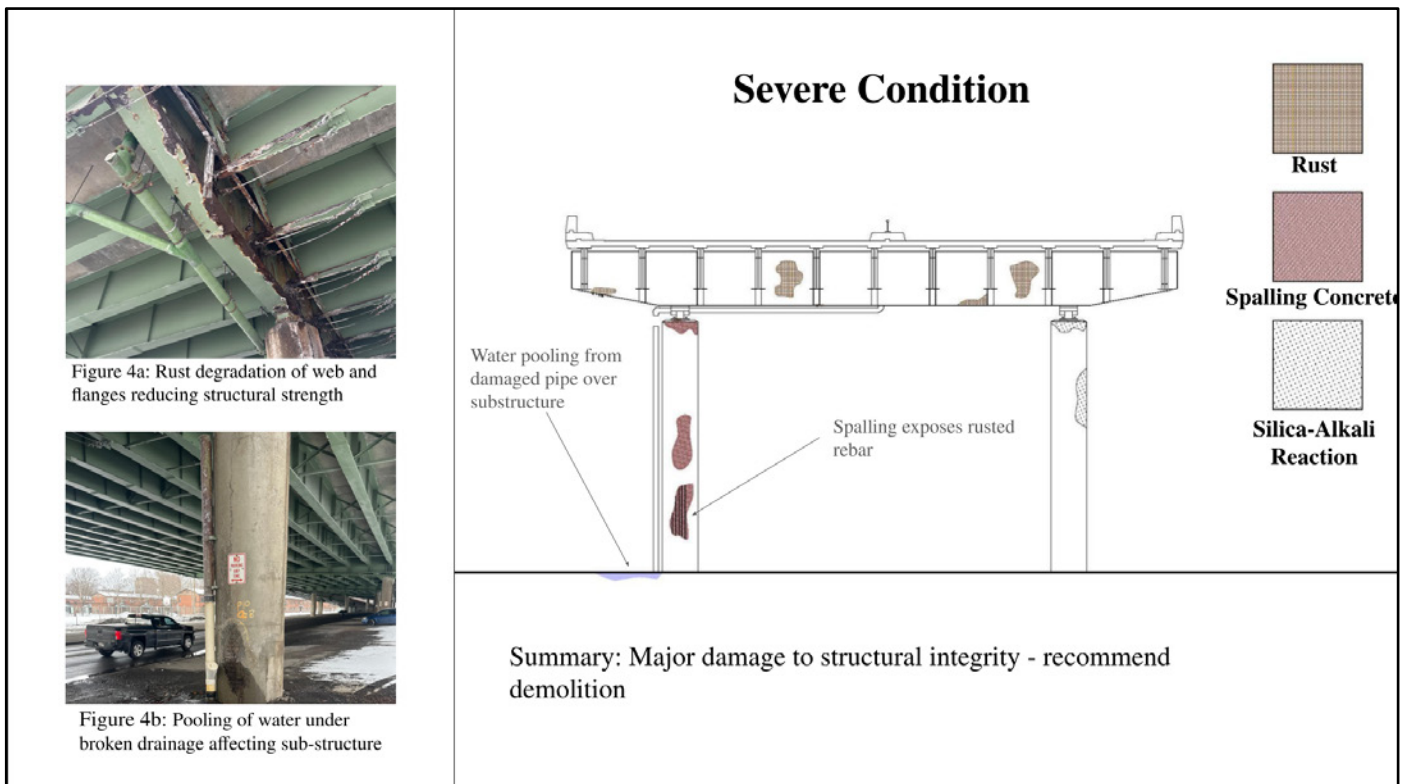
Typical section guide for visual inspection of poor condition
